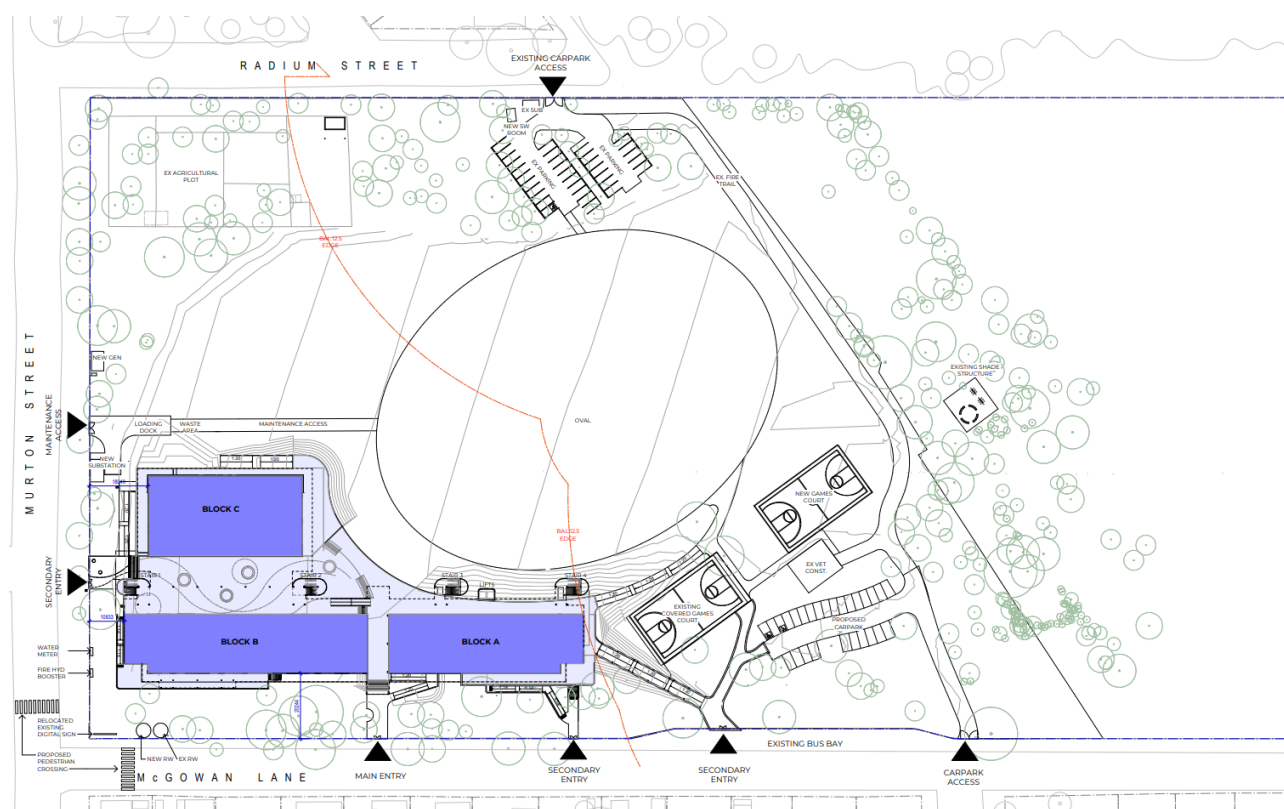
Proposed indicative site layout (Source: Woods Bagot)
